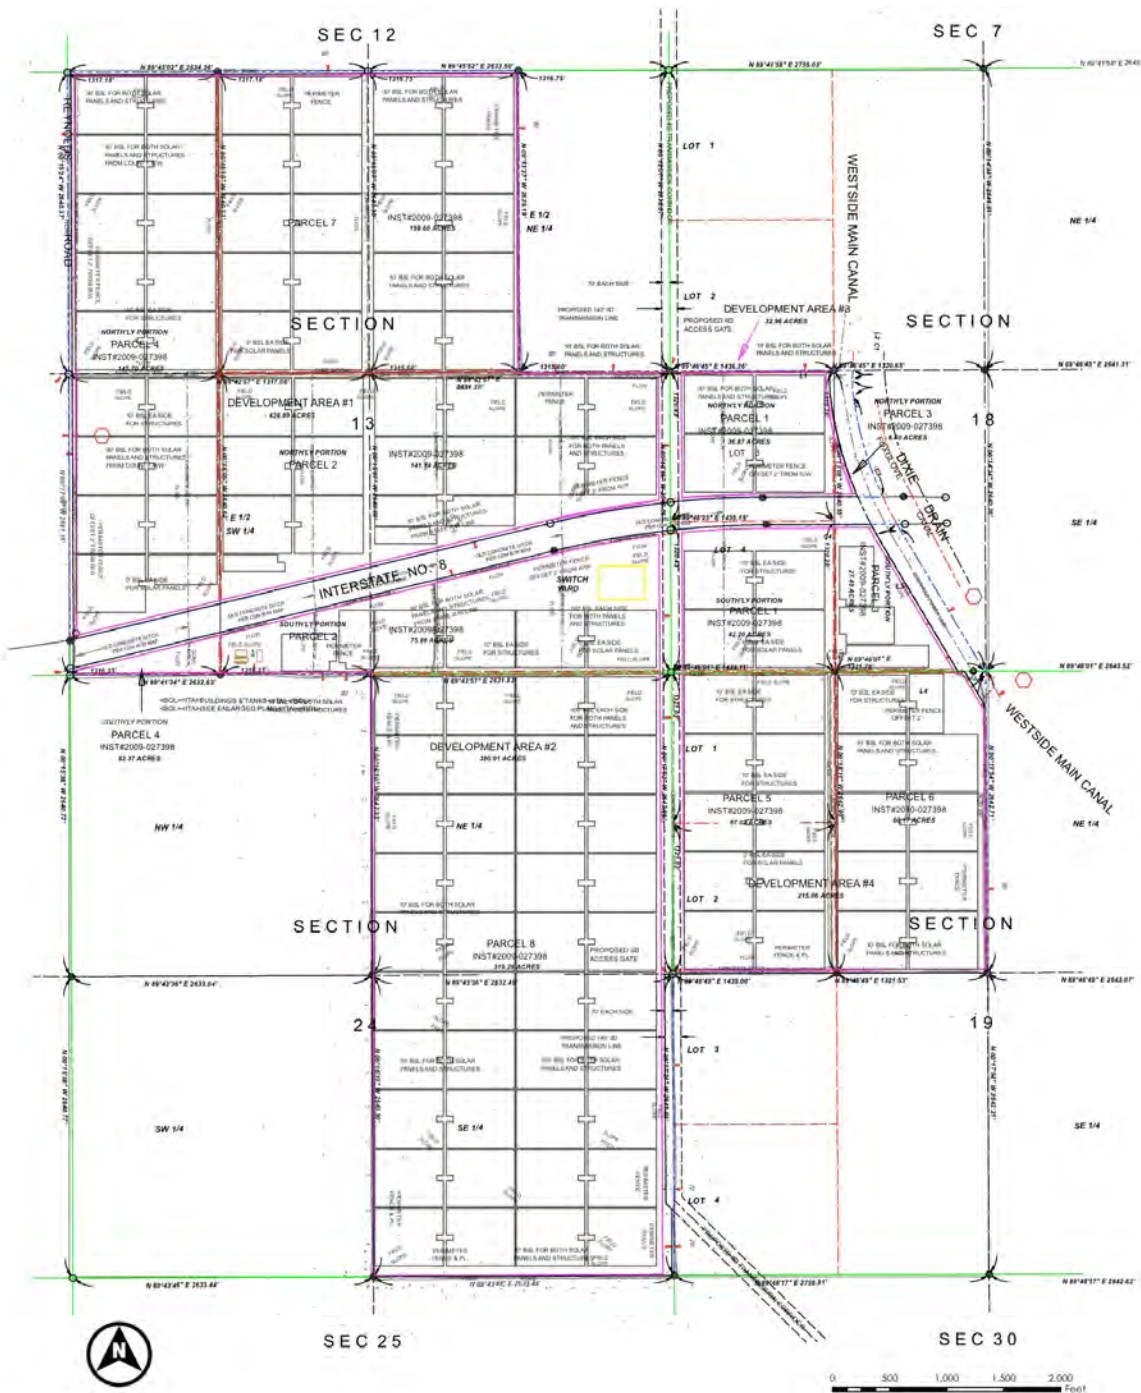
Conceptual Facility Site Plan (Zachry Engineering 2010)
